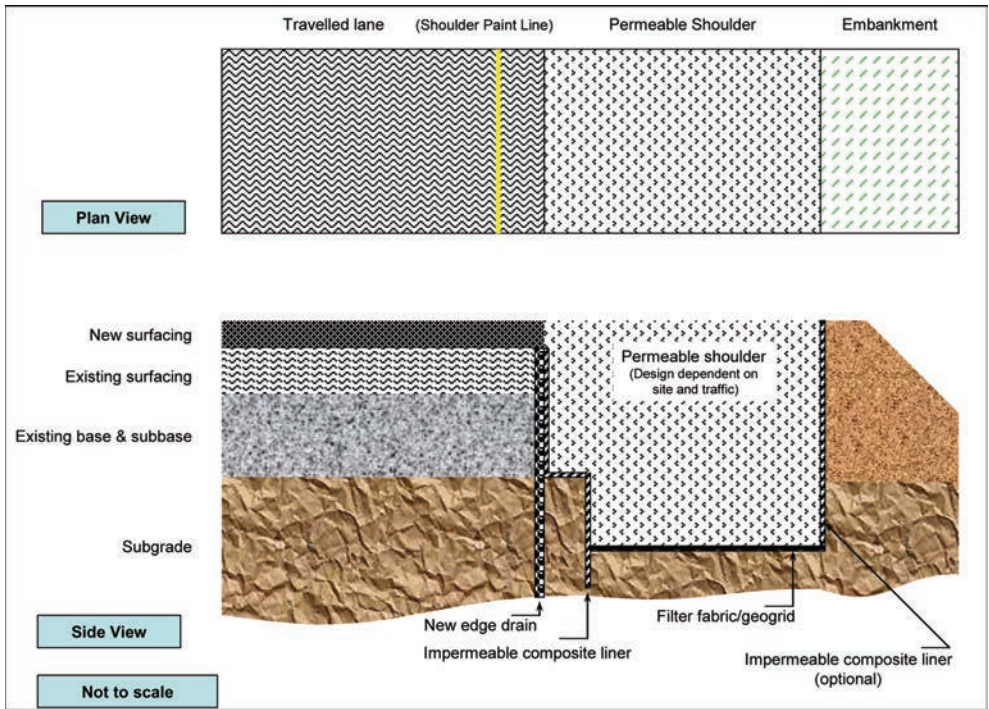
Example fully permeable pavement shoulder retrofit. (Permeable shoulder placed against pavement layers with fabric separator).
